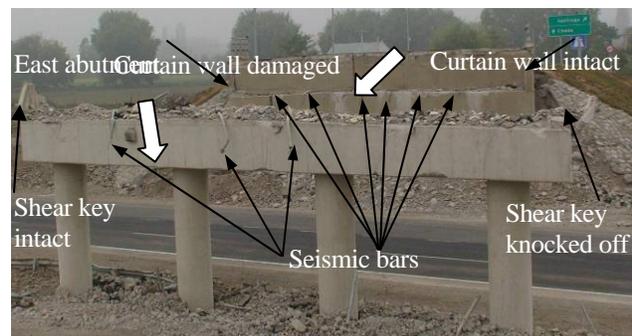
Collapse of the Lo Echevers Bridge (from MO, Chile).
